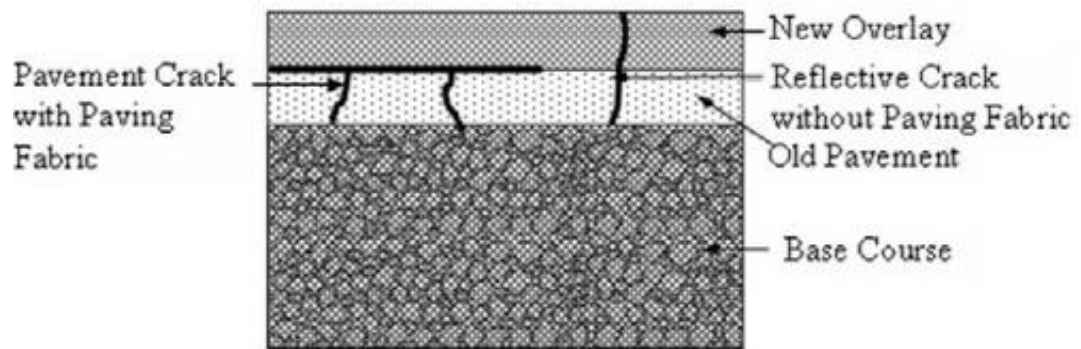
Sealing Function of Geotextiles (Agrawal, B. J. 2011)
